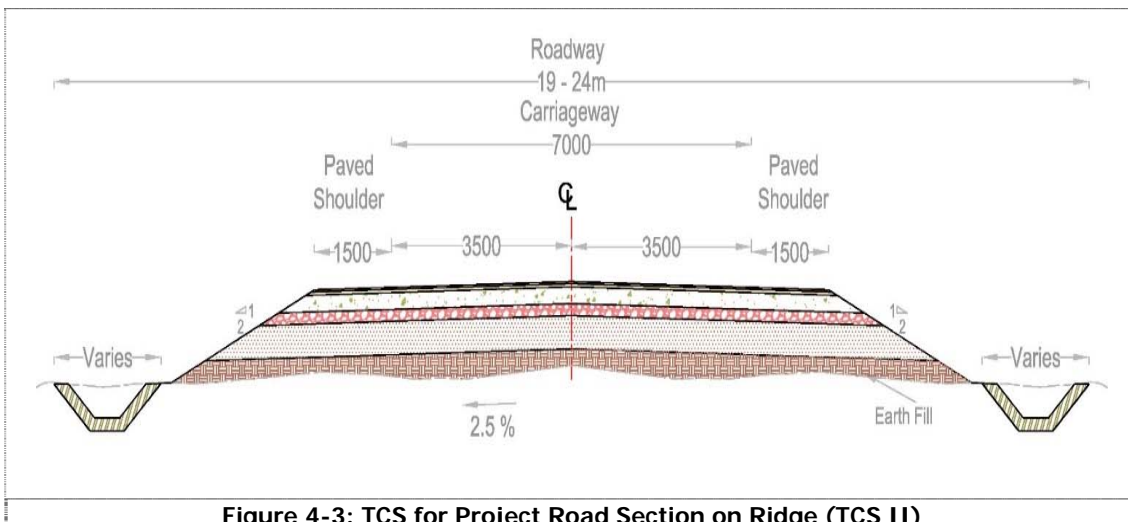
TCS for Project Road Section on Ridge (TCS II)
